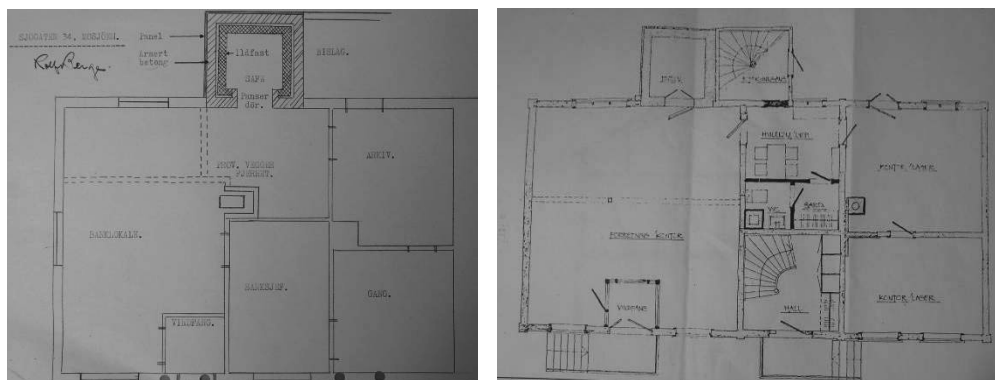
Sjøgata 26. Plan to rebuild the interior ground floor (left) including fire-proofing the ground floor, which was used as premises for a local bank, "Mosjøen bygningskontor 15/45"; regeneration plan (right) by the conservation training course from N.T.H. 1975 (Vefsn municipal building archive; Inst.for ark.hist. N.T.H.)
